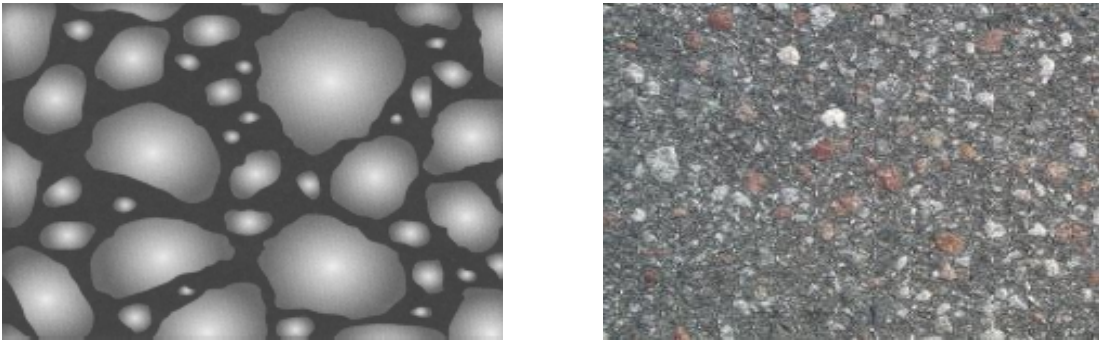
DGAC horizontal cross-section and DGAC surface texture
